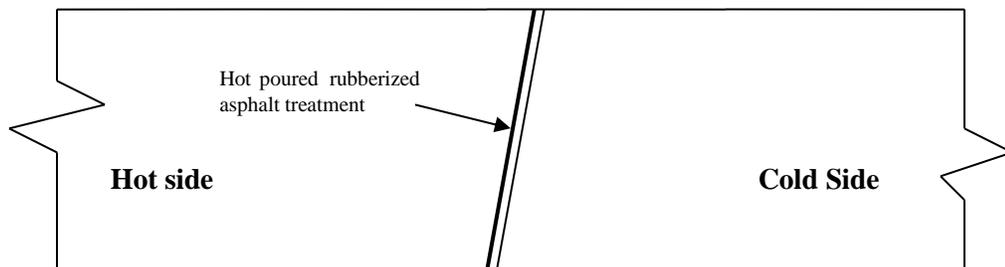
Butt Joint with Hot Poured Rubberized Asphalt Treatment
